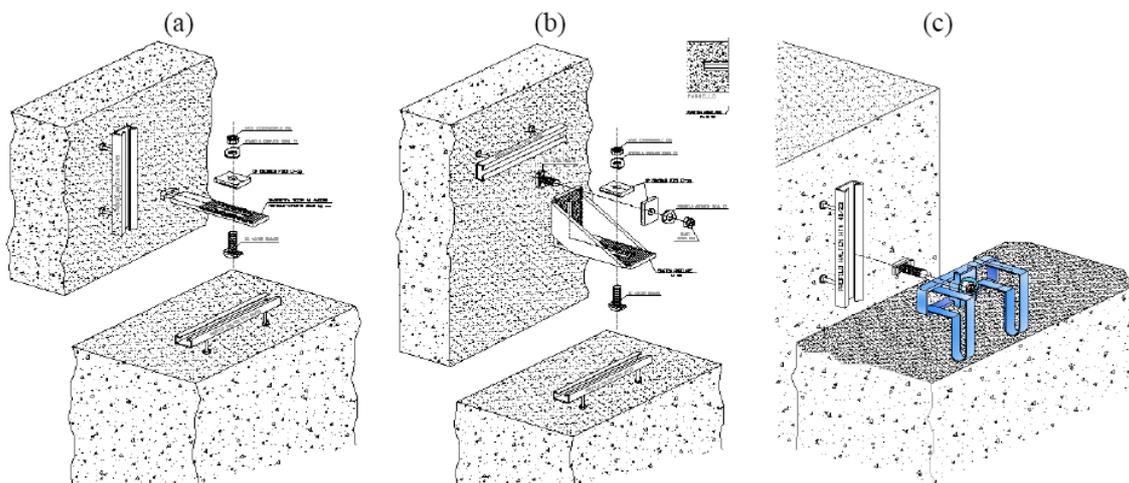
Typical panels' connections: a) sliding connection, b) angle connection, c) cantilever connection
